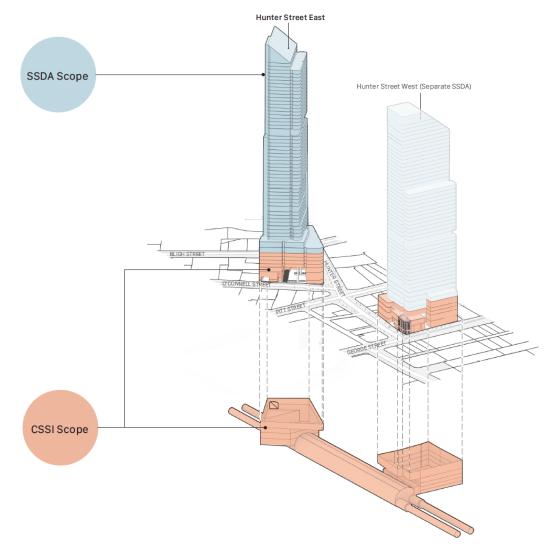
Proposed Concept SSDA development and CSSI scope
